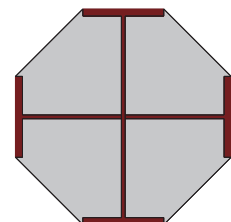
Concrete-confined Effect of Octagonal-section SC Column Member⁴⁾
